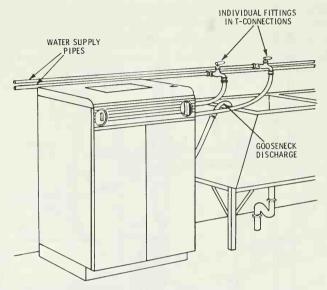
Water supply and drainage connections in a basement washingmachine installation.
